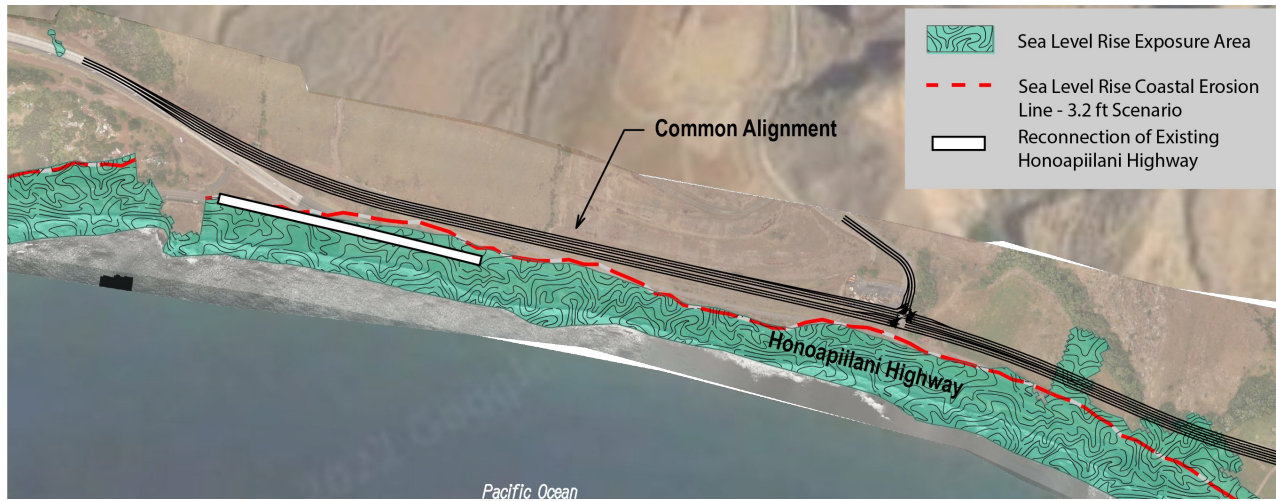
Olowalu – Refinement at Northern Connection to Existing Lāhainā Bypass
